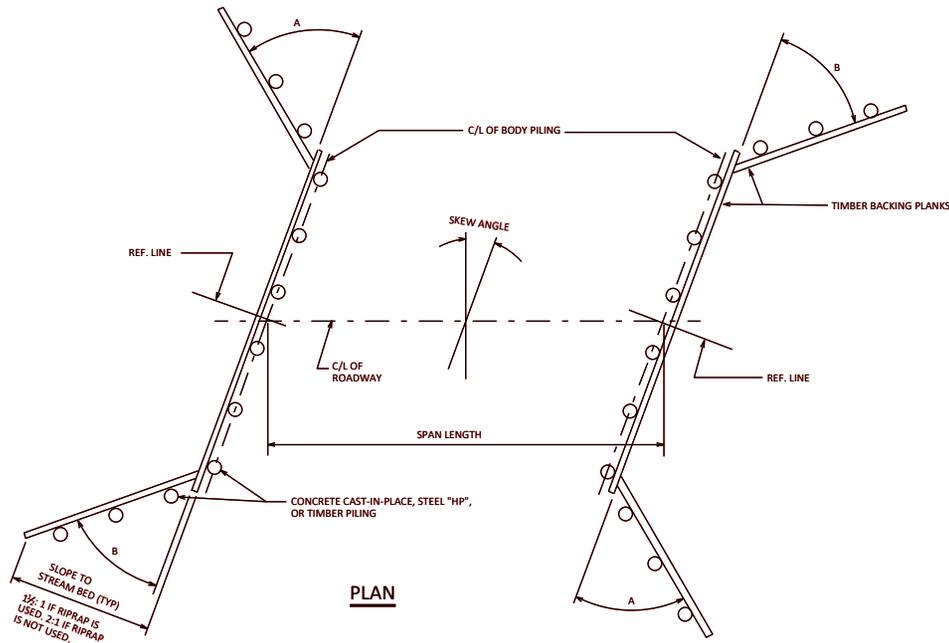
DETAILS SHOWN ARE APPLICABLE FOR CONCRETE ABUTMENTS. DETAILS TO BE MODIFIED FOR GRS ABUTMENTS.
